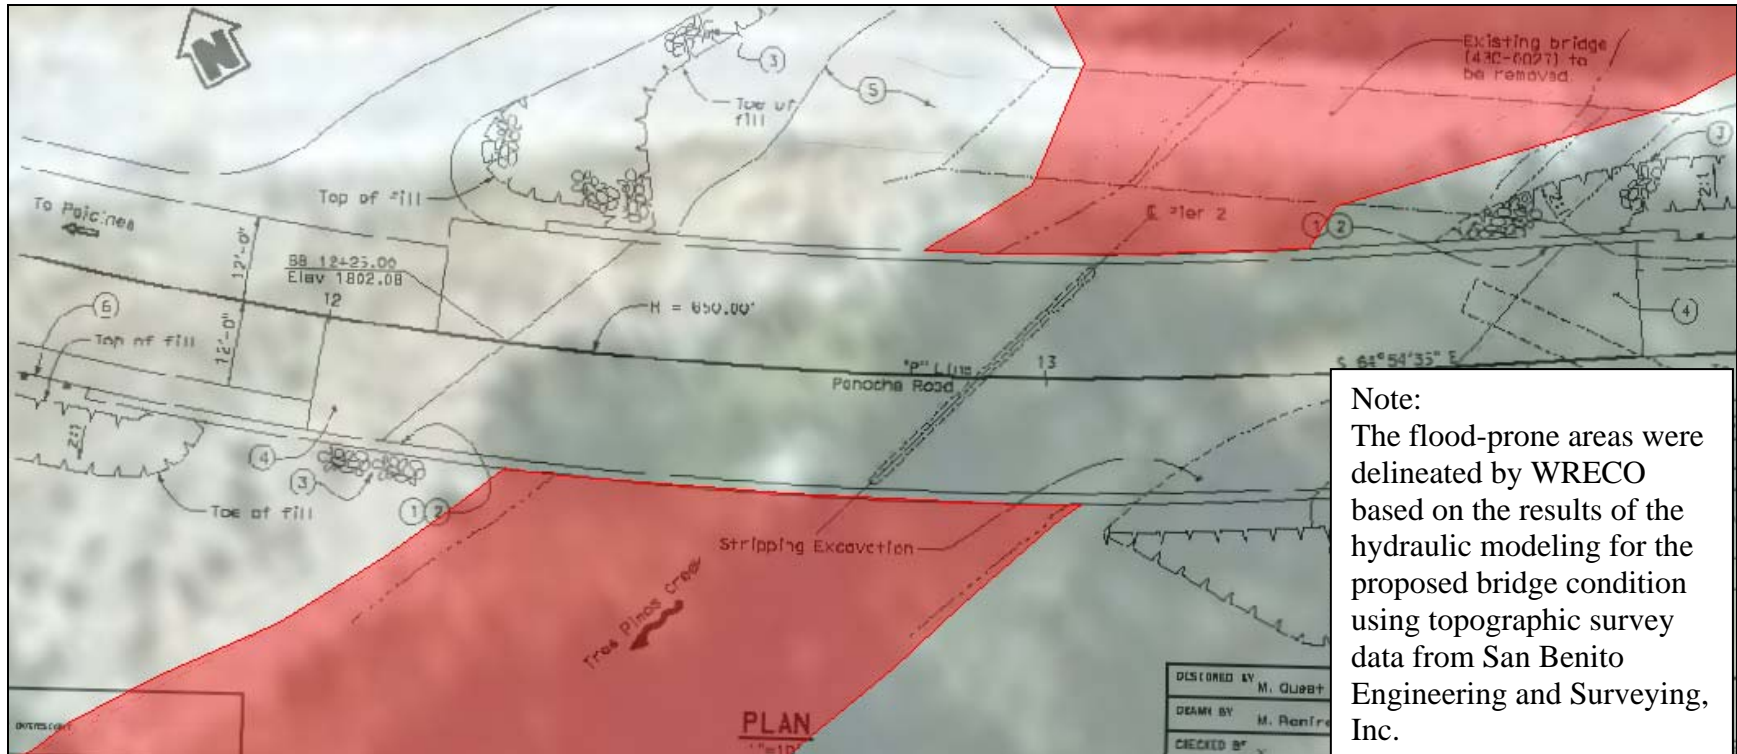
Proposed Bridge Alignment with Proposed 100-Year Flood-Prone Areas
